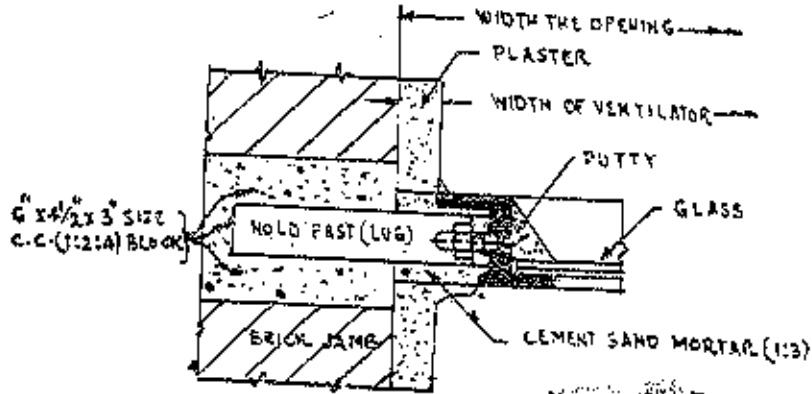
(e) MASONRY OPENINGS WITH PLASTER.
